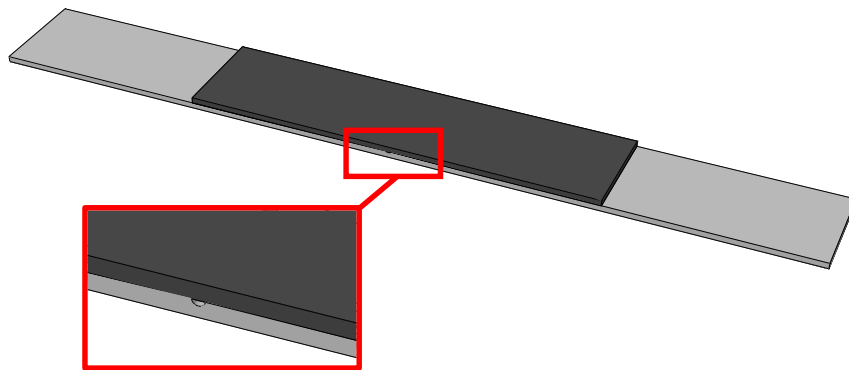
Figure 1.2 CFRP Repaired steel sheet specimen.
